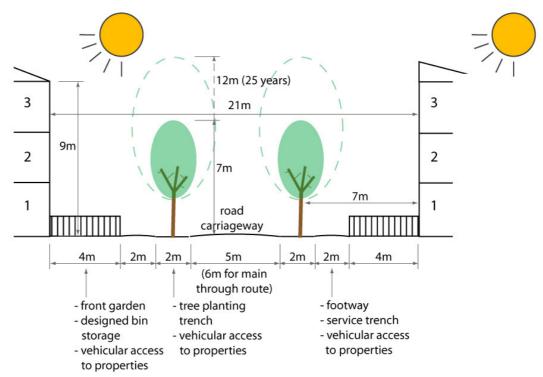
Wider streets require three storey buildings to create enclosure. Space for medium sized street trees, in scale with the buildings, is now available, creating a further sense of enclosure and more attractive streets.
